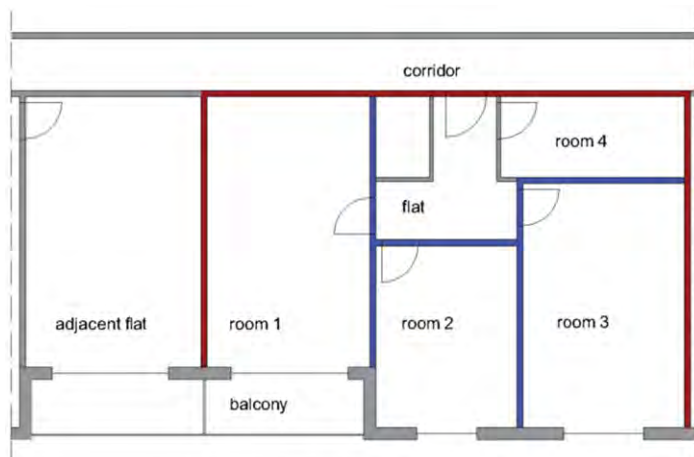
Walls in red would be exposed to fire from one side only. Walls in blue could be exposed to fire from two sides
